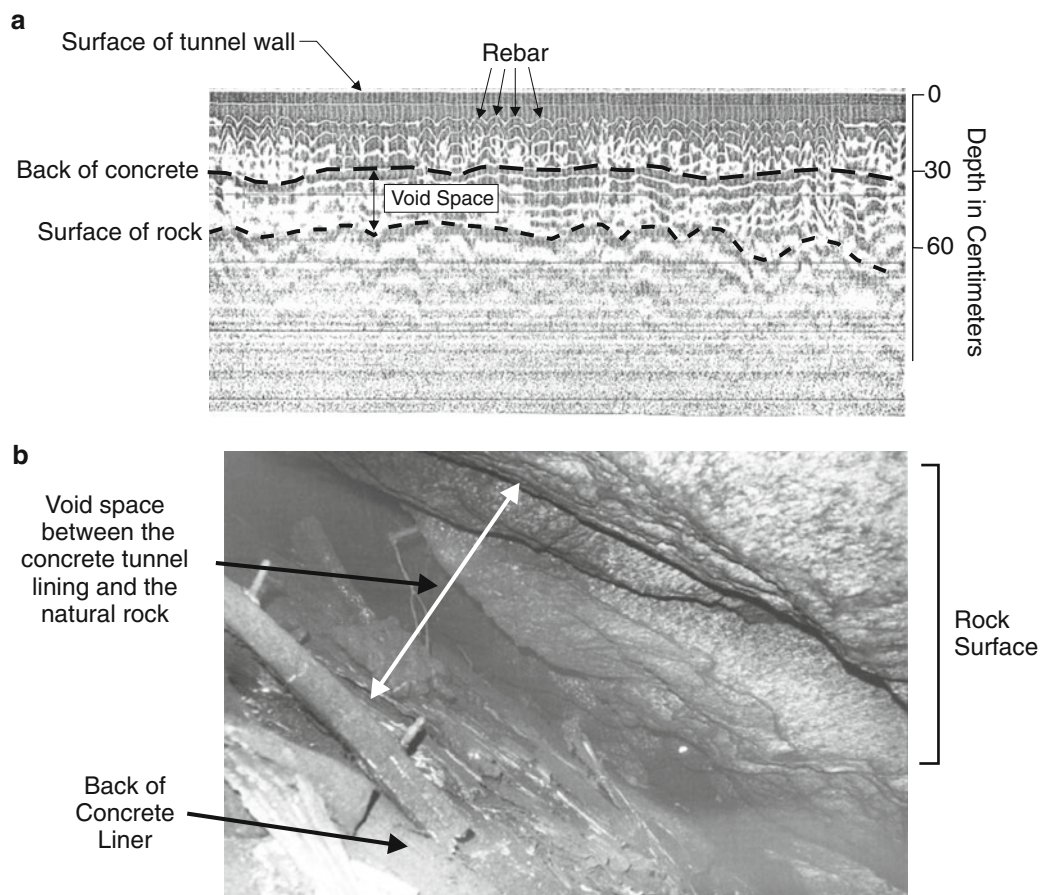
An example of shallow radar data illustrating the level of detail that can be achieved shows the thickness of the concrete tunnel lining, the reinforcing steel bars within the concrete and the void space
